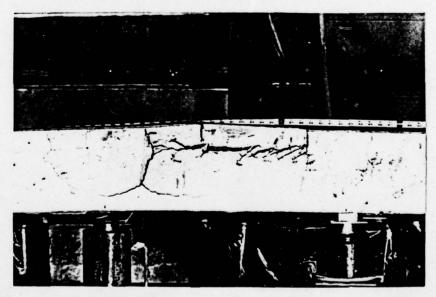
Failure of Beam T-3-P. Ultimate load = 10.0 kpj. Splice length = 16 inches. Note the extension of the side splitting cracks and their zipper-like action on the PCC.
